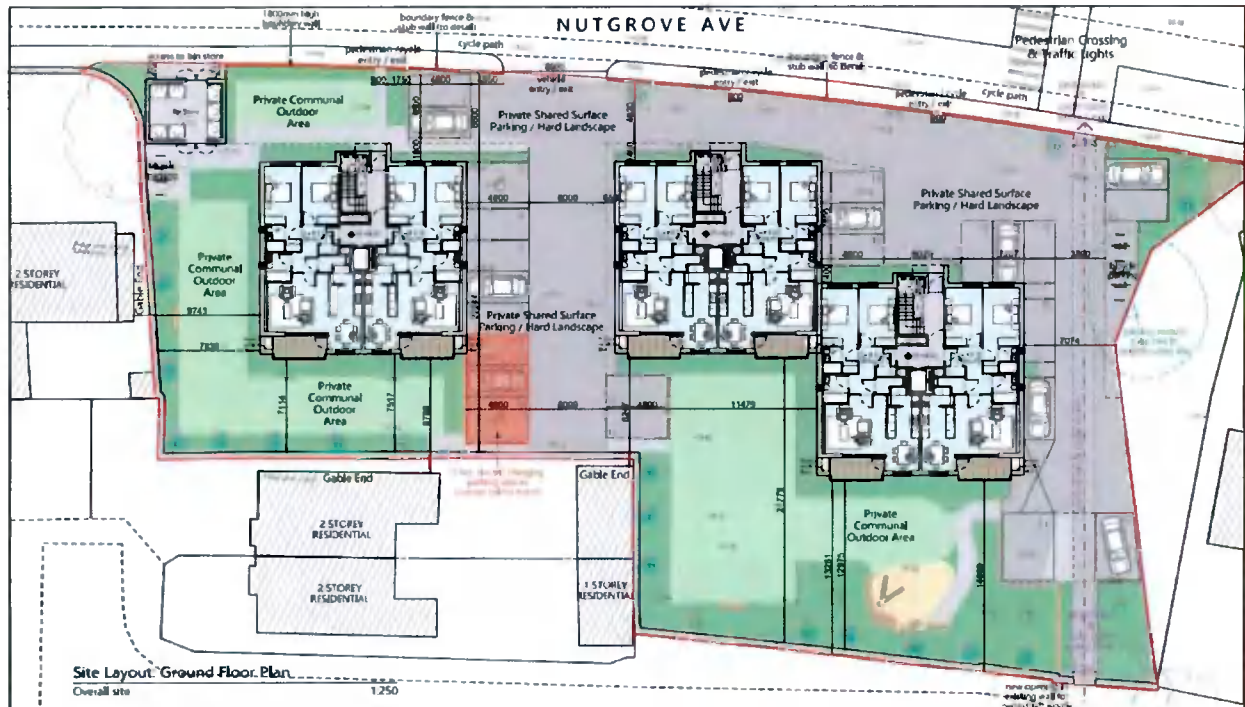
SITE LAYOUT PLAN - PREVIOUS APPLICATION (SOURCE: HORAN RAINSFORD ARCHITECTS)
